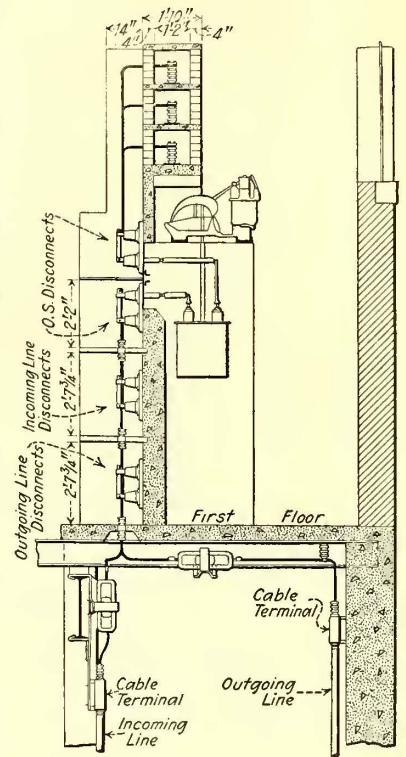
CROSS-SECTION OF HIGH-TENSION BUS STRUCTURE, SHOWING ARRANGEMENT AND CONNECTION OF OIL SWITCHES AND DISCONNECTS
